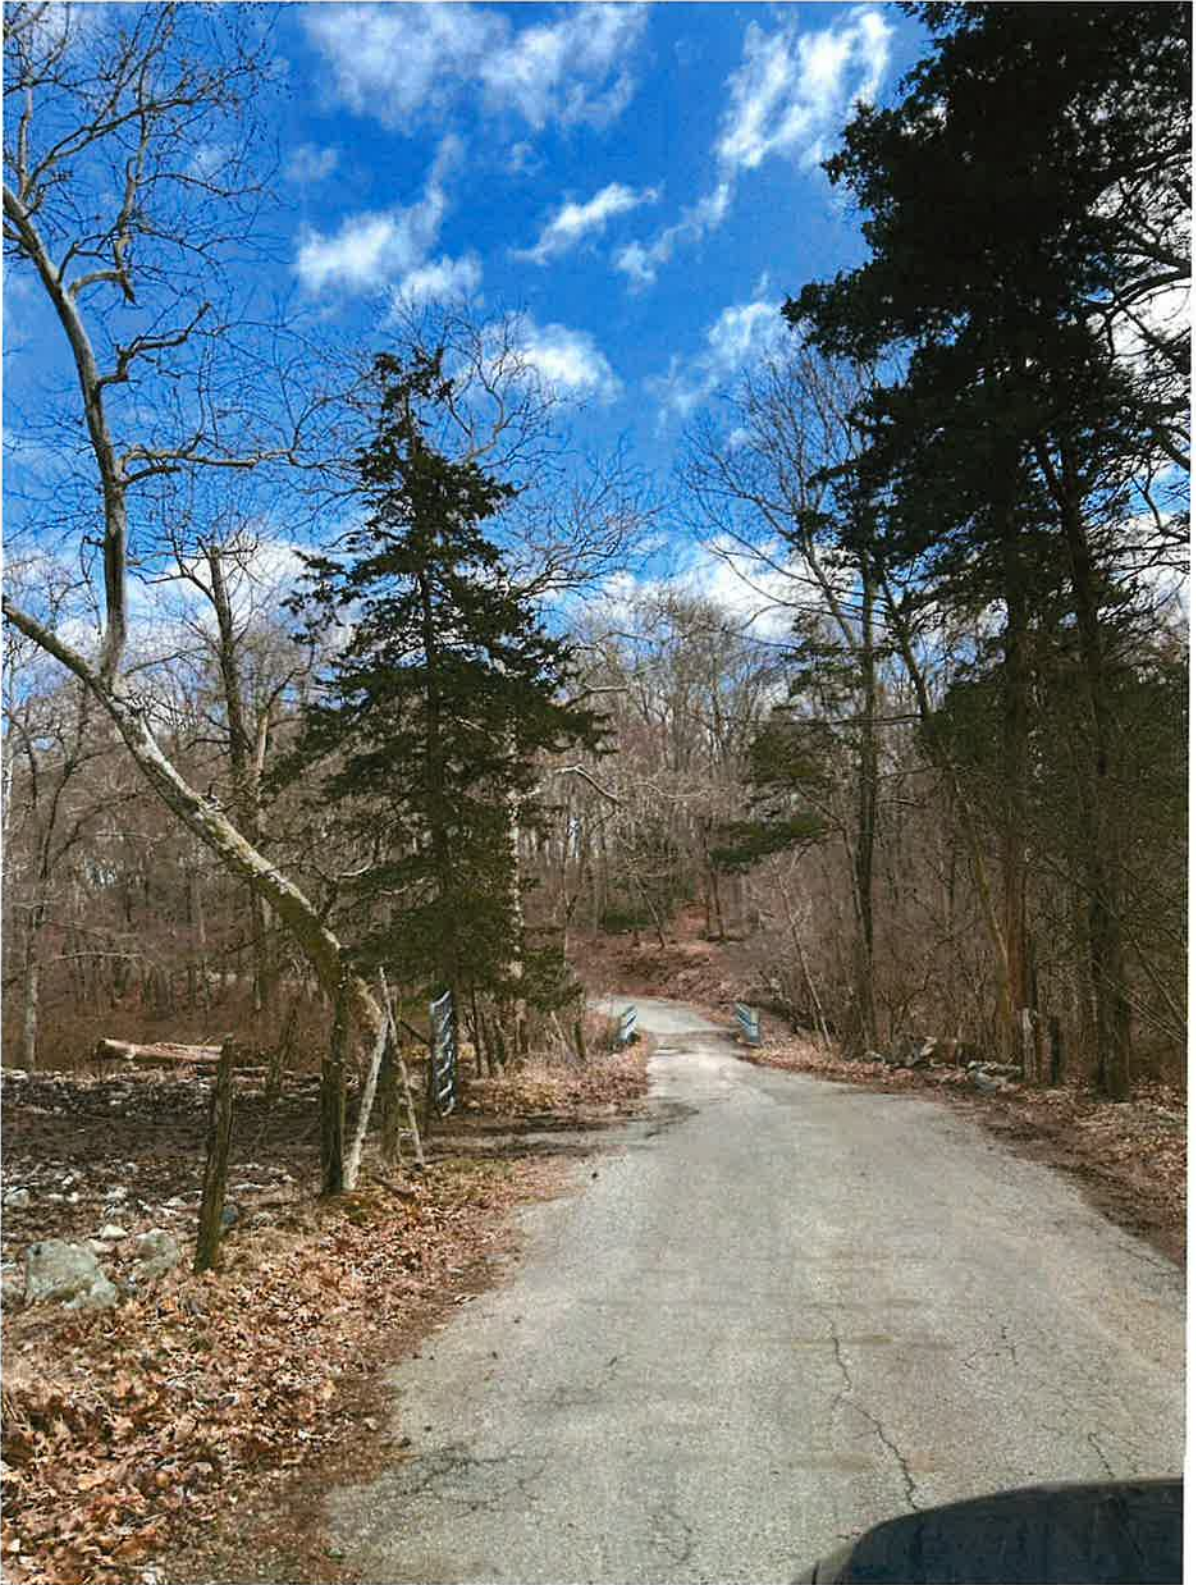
Site access road (Private way off Roosevelt Ave Extension)
